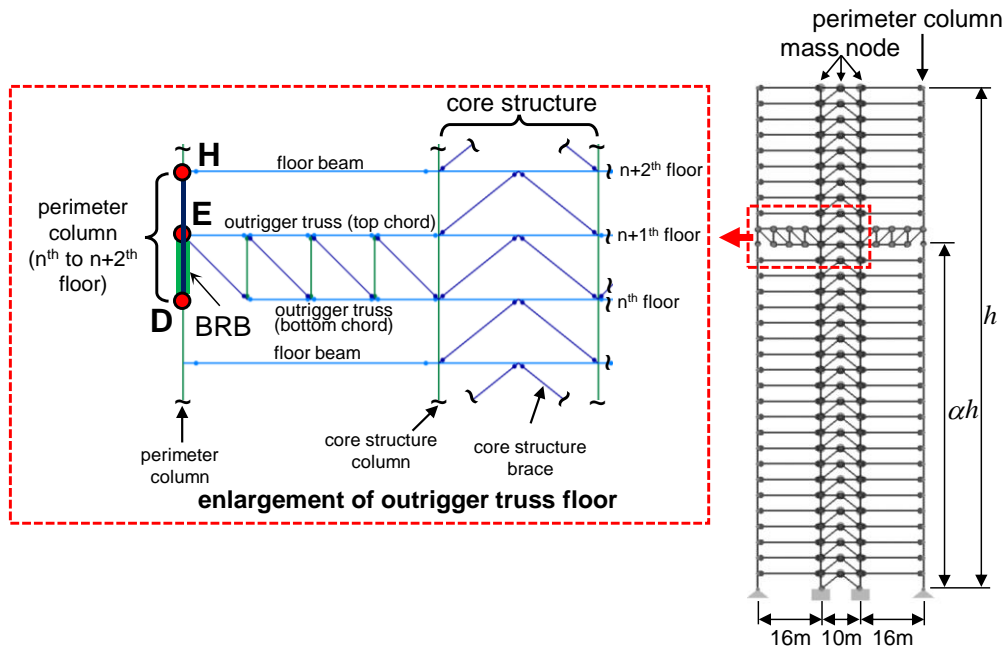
Elevation and enlarged BRB-outrigger detail of MBM model
